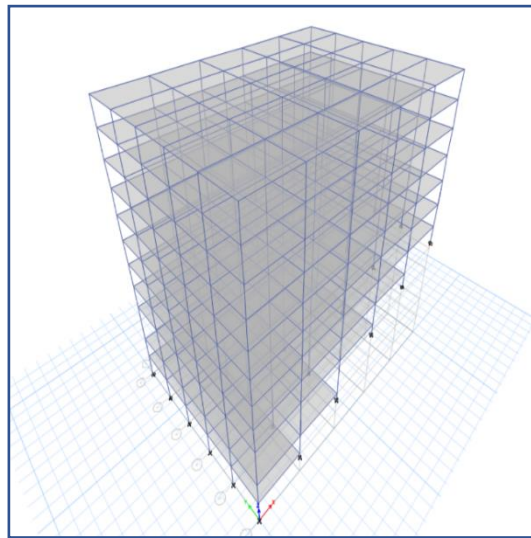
Typical 3D plan of G+10 RC 20° slope Surface Building.
